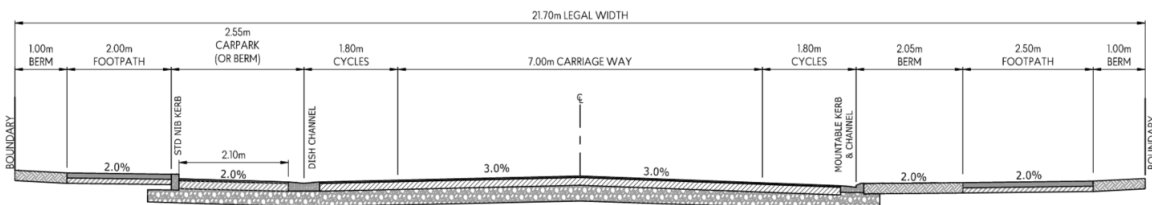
Typical Cross-Section (A) Collector - 21.7m With Cycleway and Carpark
